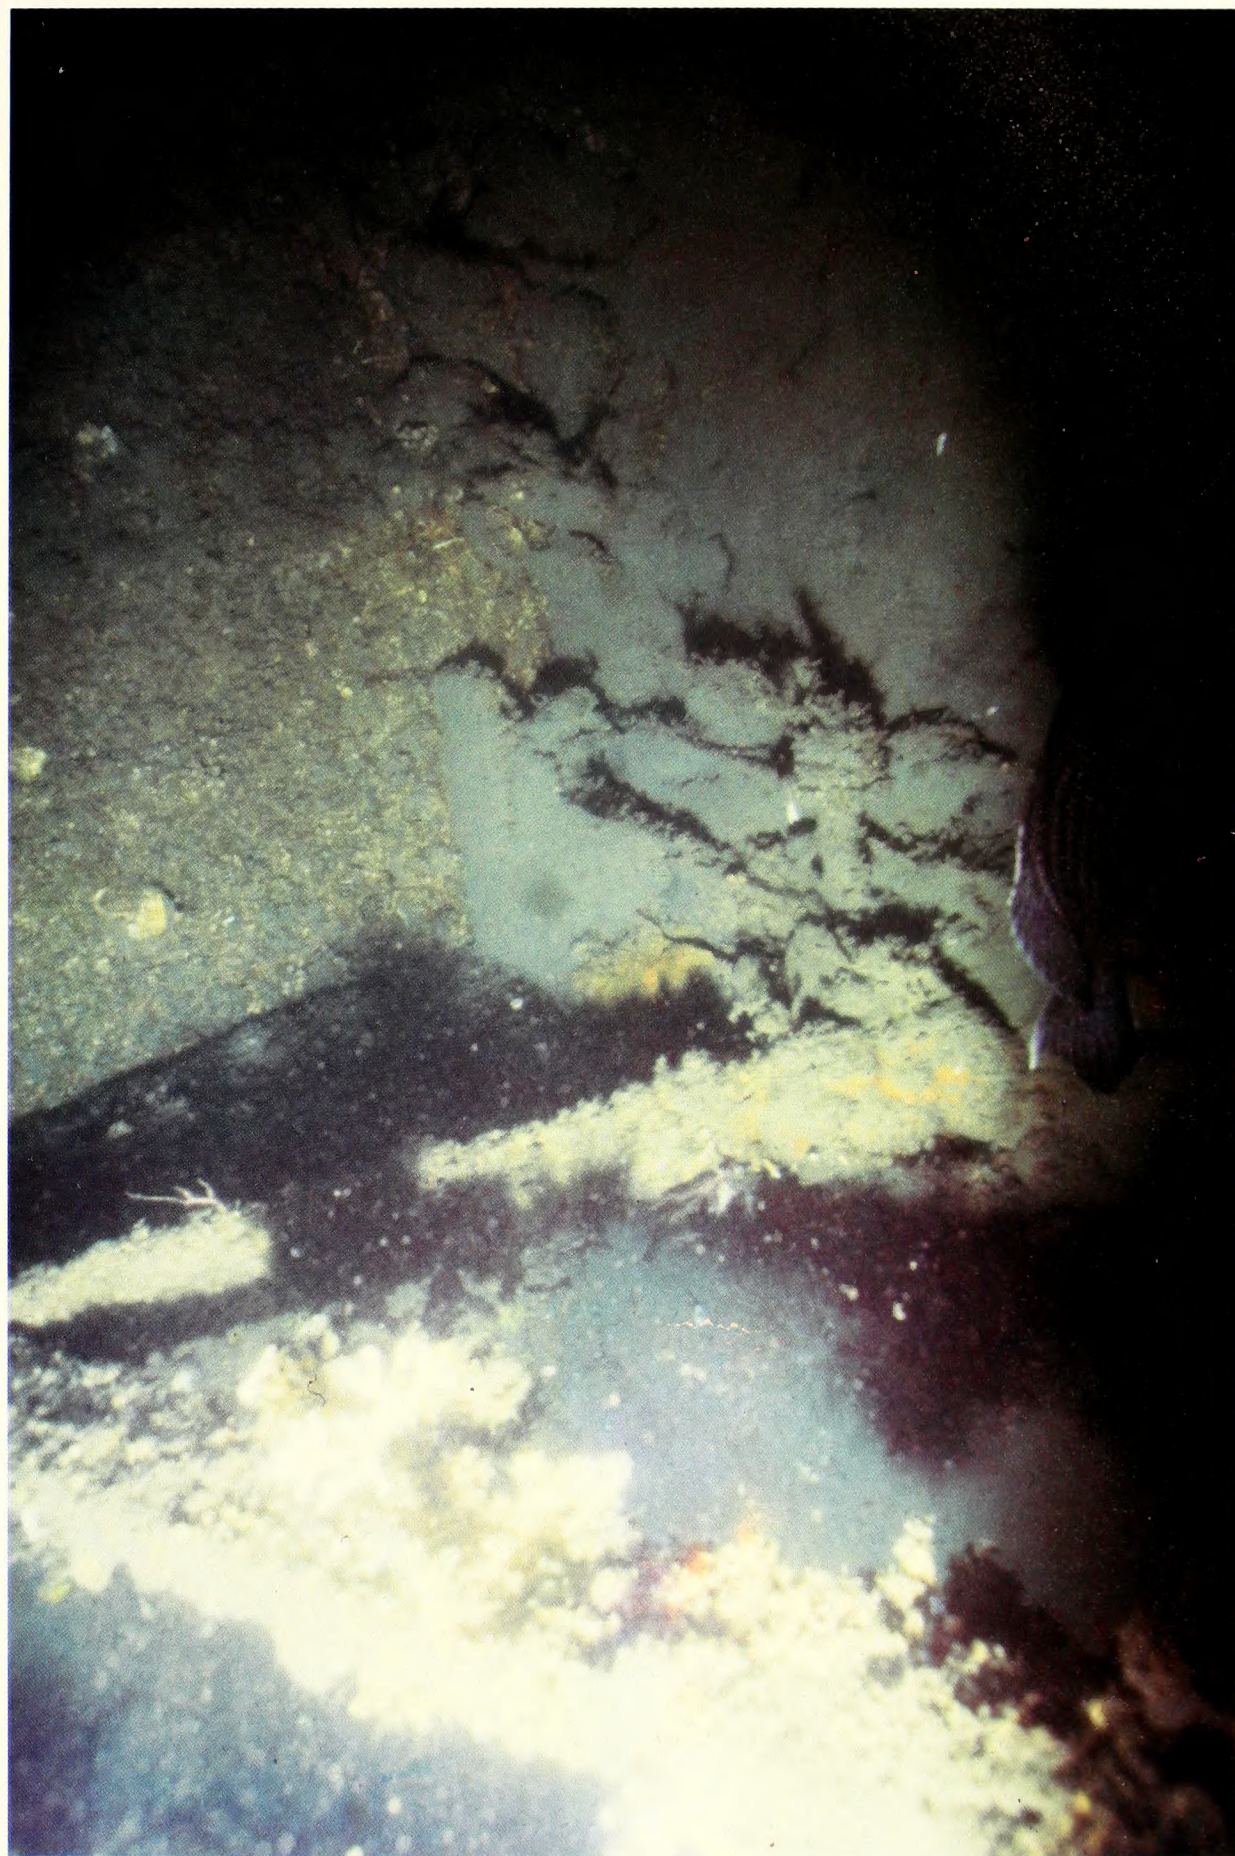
Diagonal bracing inside the port armor belt rests on the deteriorated remains of a wood deck beam.
